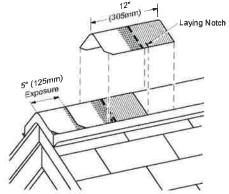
Use laying notches to center shingles on hips and ridges, and to locate the correct exposure.
